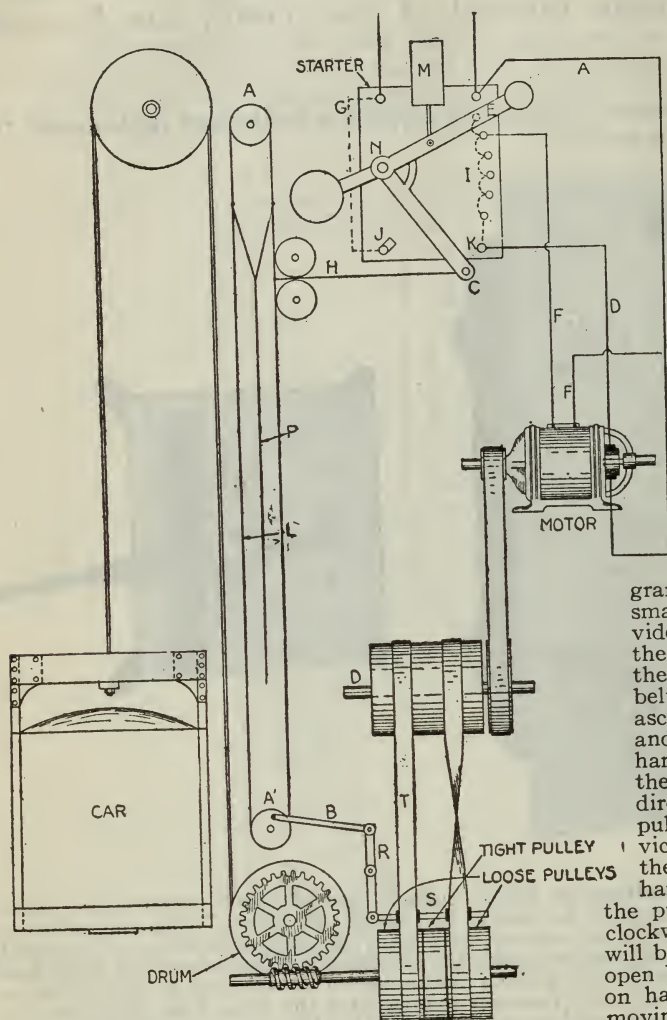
,138.—Continuous operating non-reversible full mechanical belt driven elevator control system. As shown the elevator machine is provided with a tight center pulley and loose pulleys on the two sides. The belts are shown on the loose pulleys, one being open and the other crossed. The countershaft carries a drum wide enough to allow for the side movement of the belts when one or the other is shifted upon the tight center pulley by the belt shifter S. To operate the elevator a hand rope is provided which runs up the elevator shaft at one side of the car from bottom to top of building. This rope is shown in the
